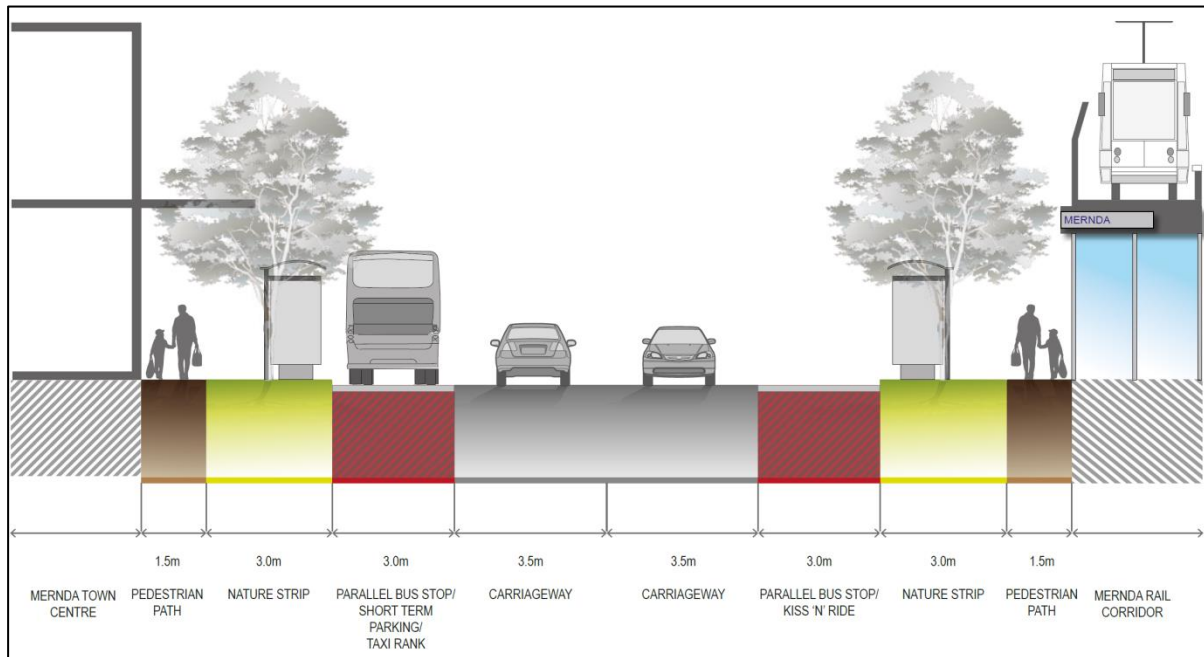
Indicative Road Cross Section C- Riverdale Blvd and Main Street (part)
